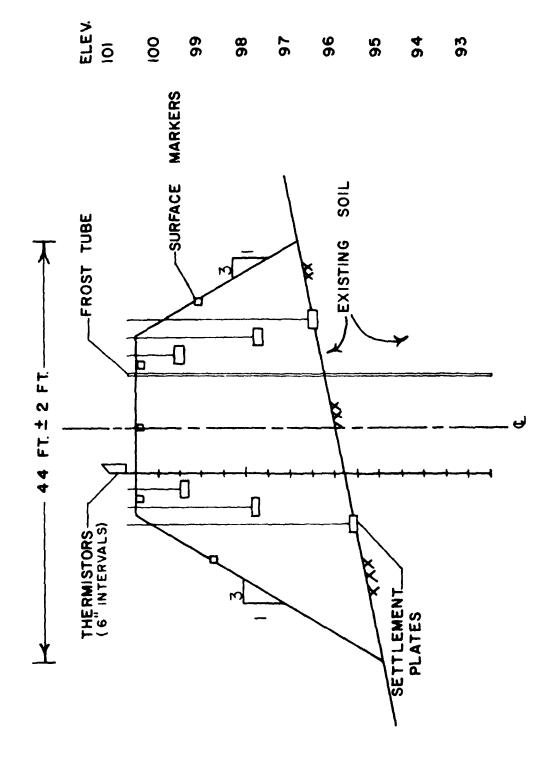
TYPICAL CROSS-SECTION OF INSTRUMENTATION.
